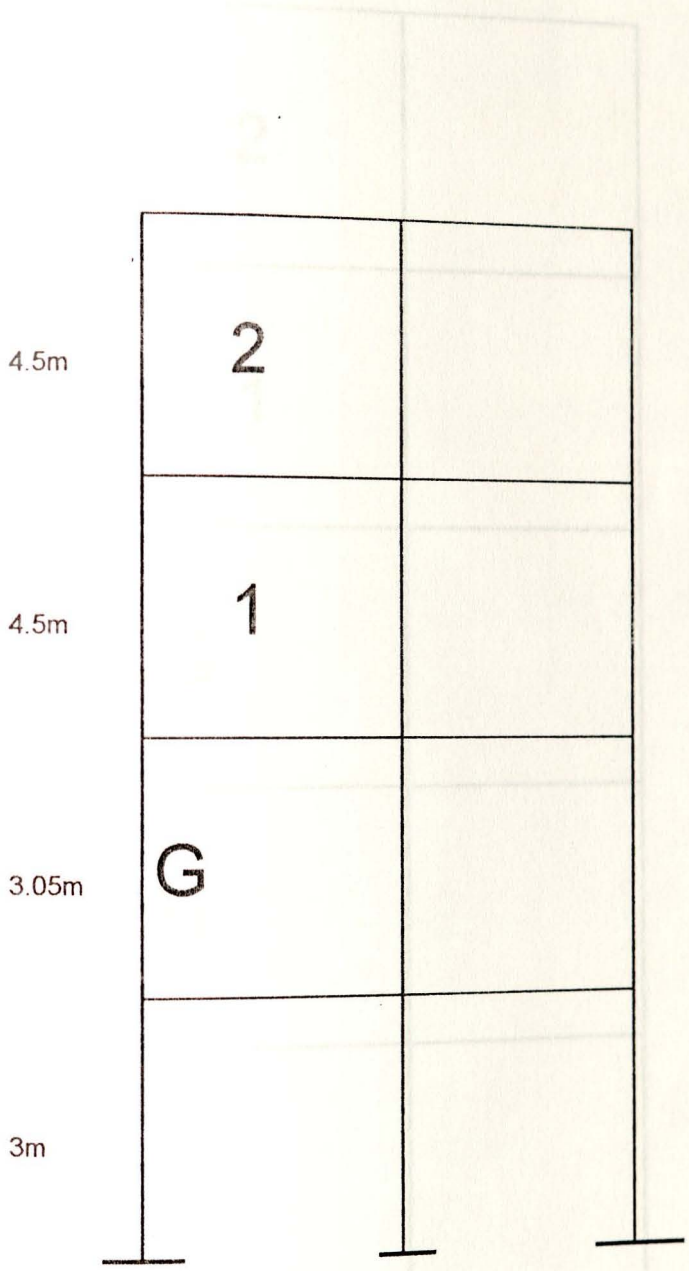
TELECOMMUNICATION EXCHANGE BUILDING ELEVATION (NEW).
